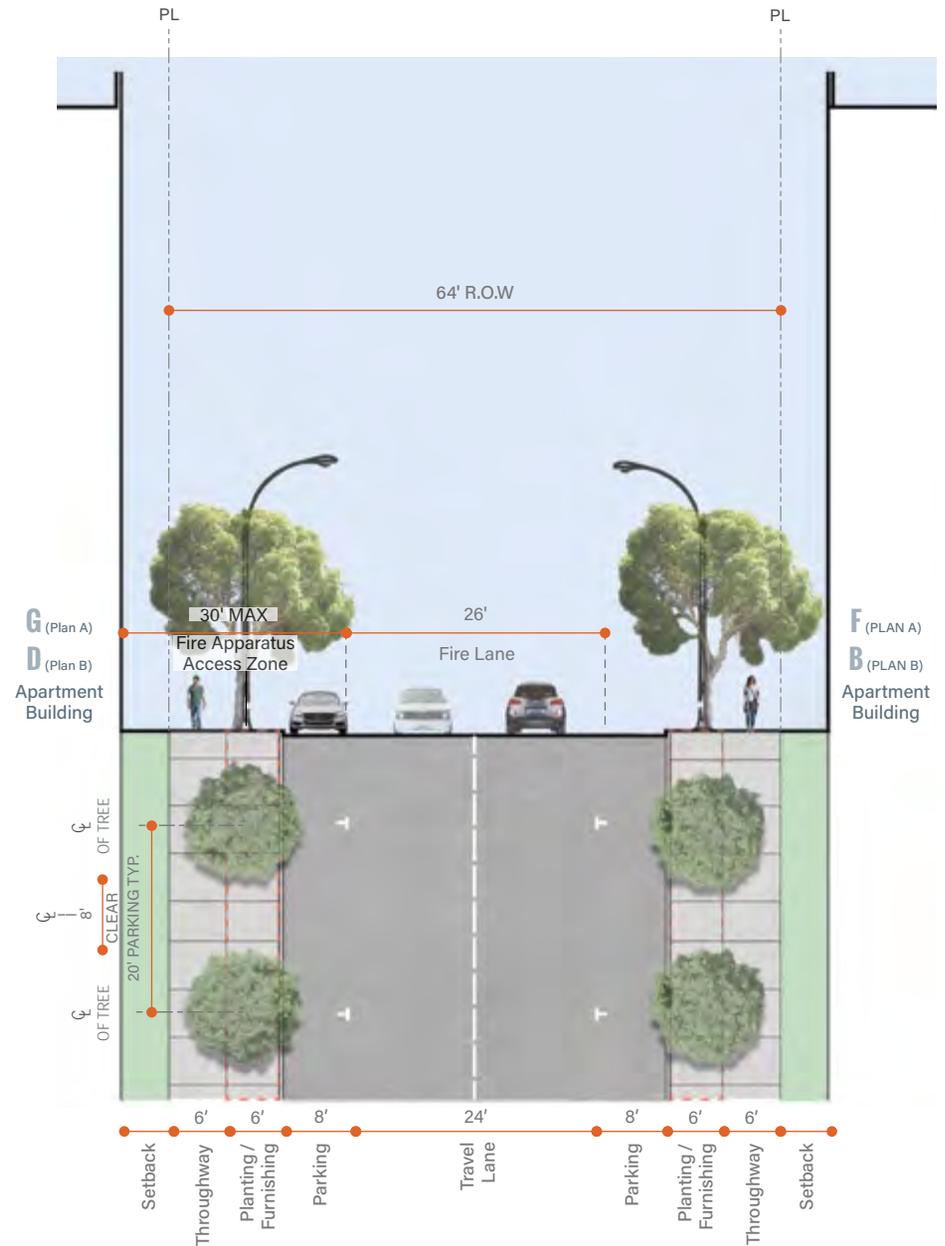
North & South Street, Section 1 *see "Figure 5.13-3: North & South Street, Plan Enlargements N.1 & S.1
